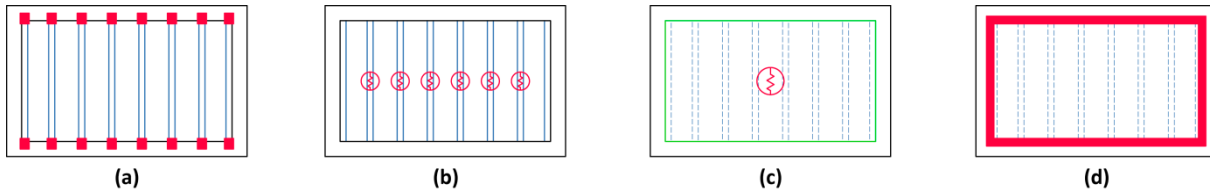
Details of the characterization of horizontal diaphragms: (a) level of connection between timber beams and walls (k_c); (b) stiffness of the beams (k_b); (c) stiffness of the diaphragm (k_d); and (d) level of connection between the diaphragm and the walls (k_{dc})
